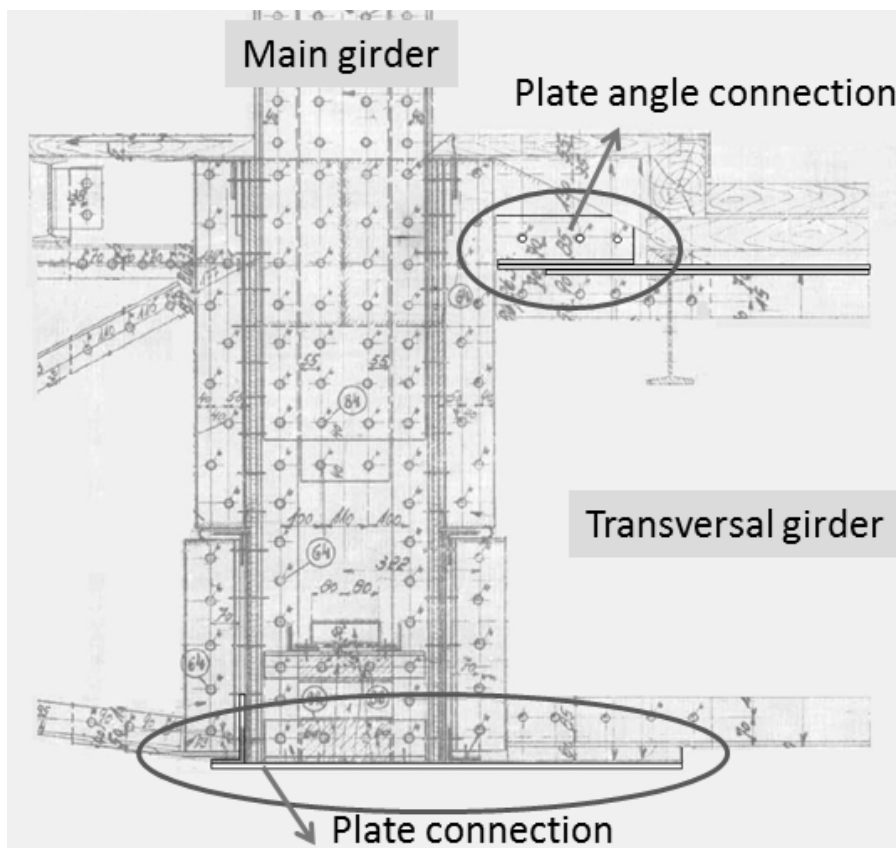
Detail of moment resisting connection between main girder and transversal girder.
